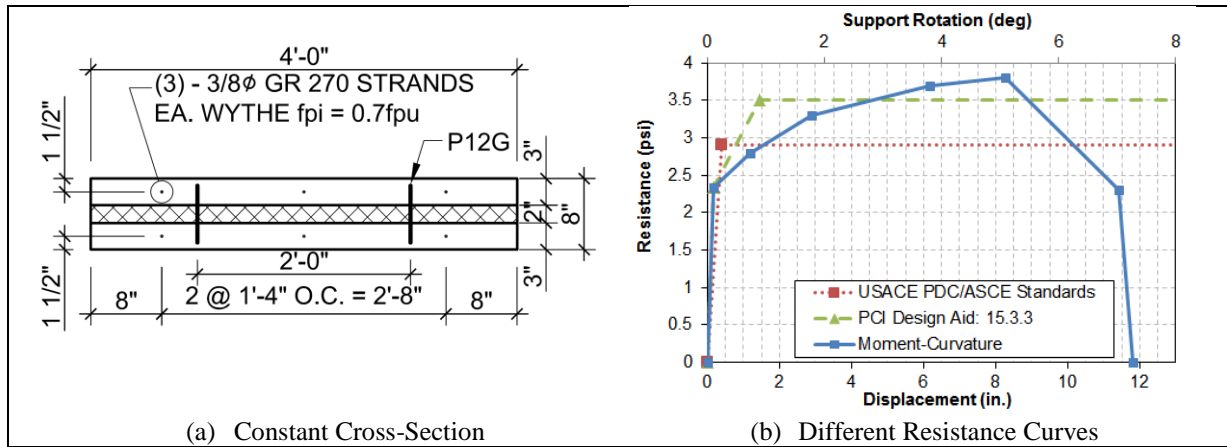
Simply-Supported 16 ft Non-Load-Bearing Prestressed Concrete Sandwich Panel
